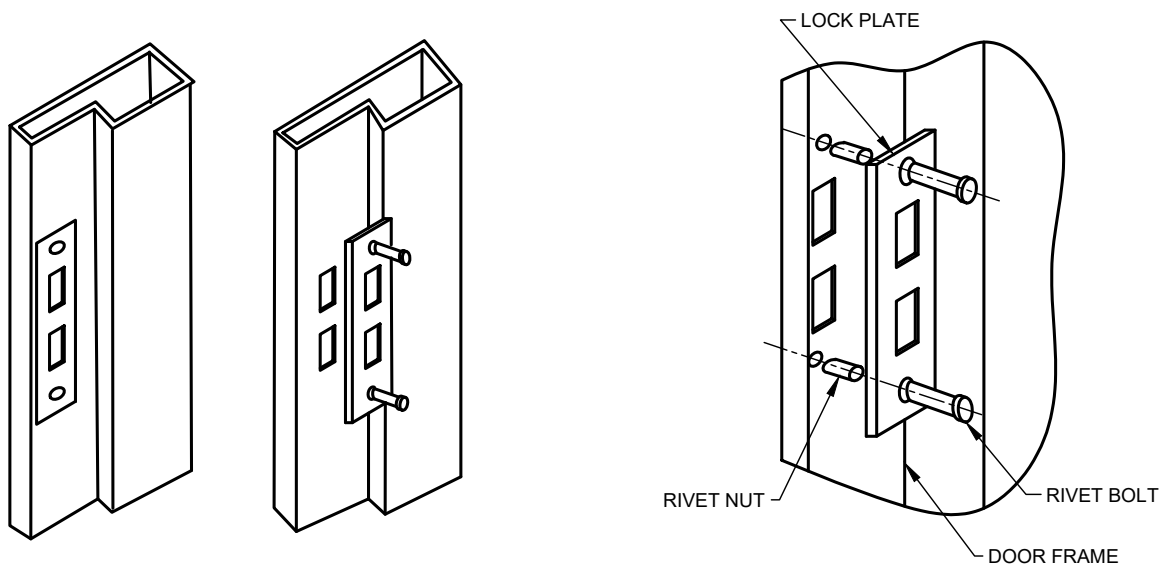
HARDWARE FIXING TYPICAL DETAILS FOR TUBULAR FRAME
